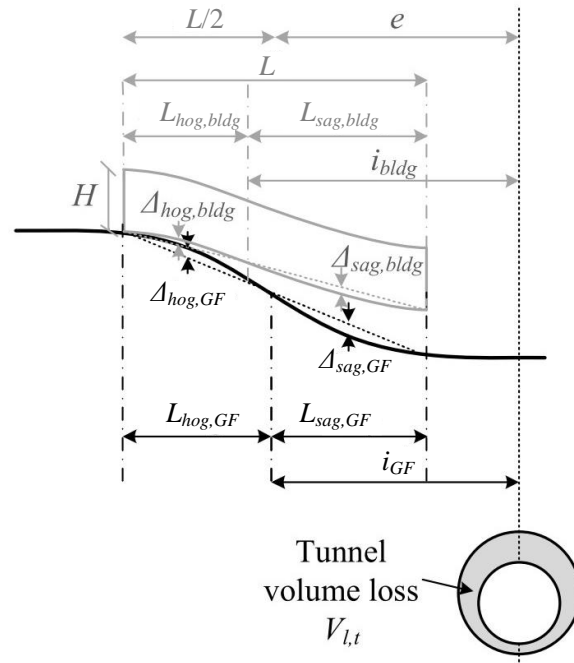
Definition of sagging and hogging parameters in tunnel-building scenarios (Franza, 2017)
